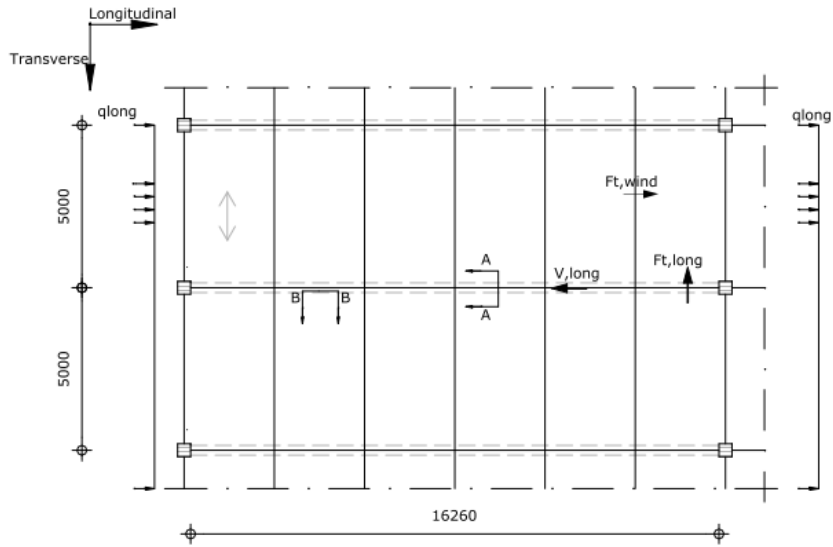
Floor system forces longitudinal diaphragm action in mm
